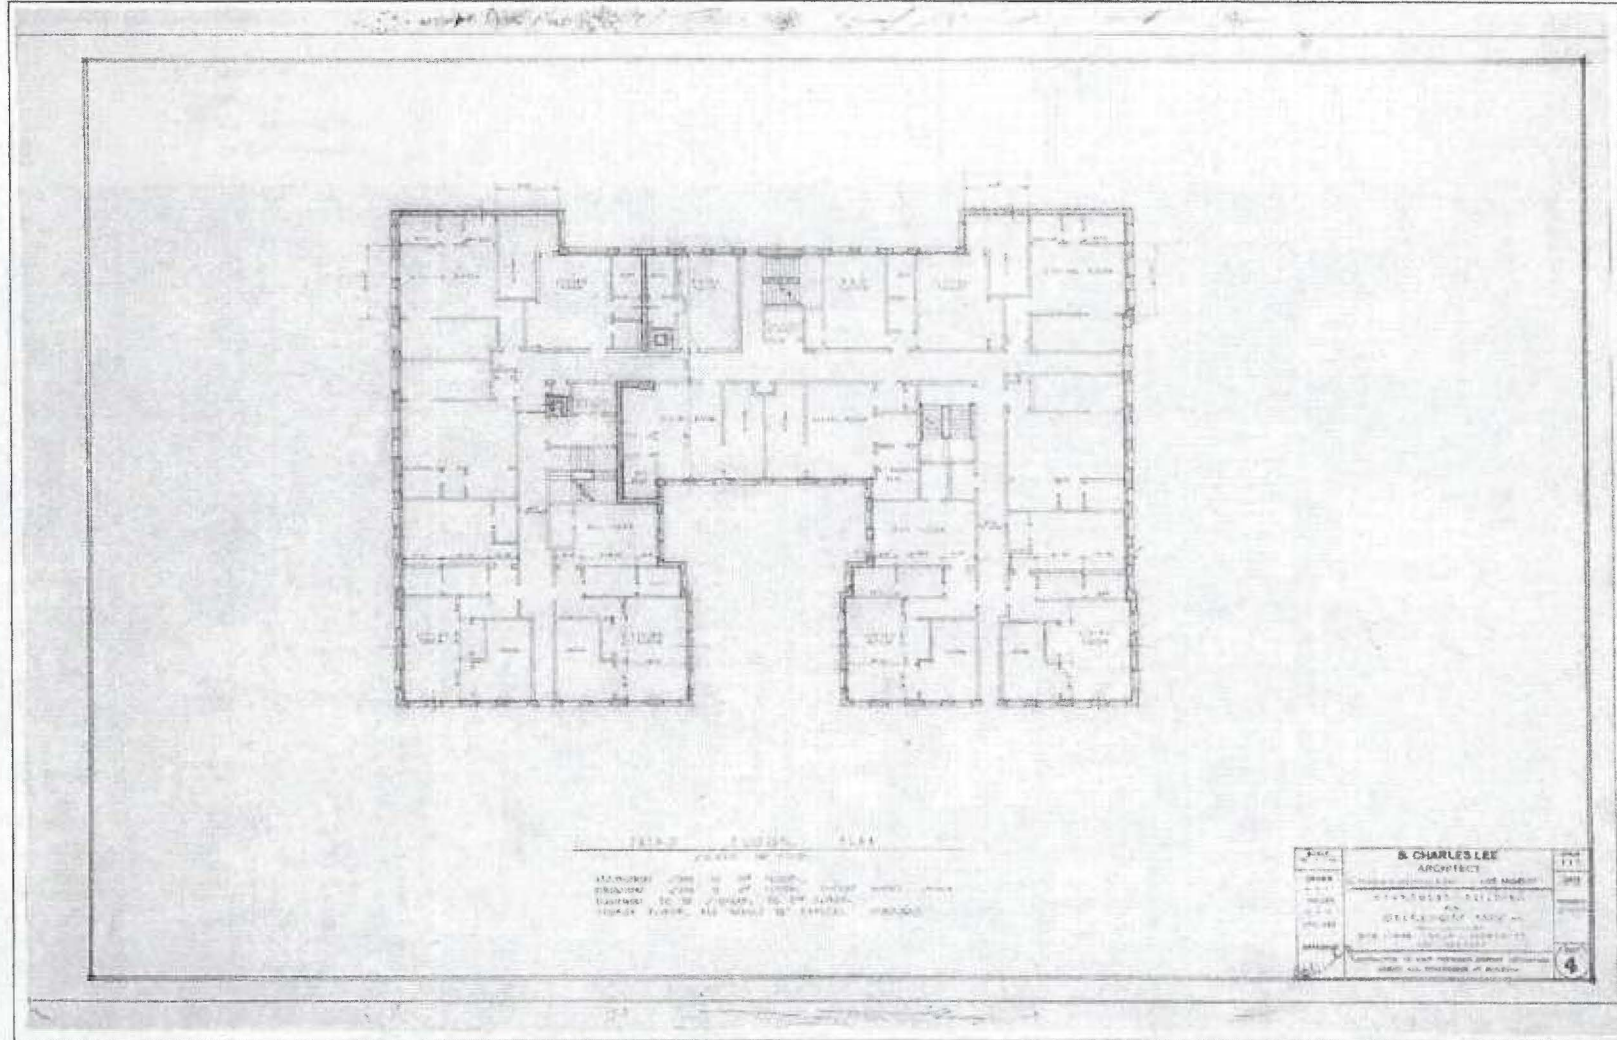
First floor plan (UCLA Library Special Collections Department, S.C. Lee Collection, 1925)
